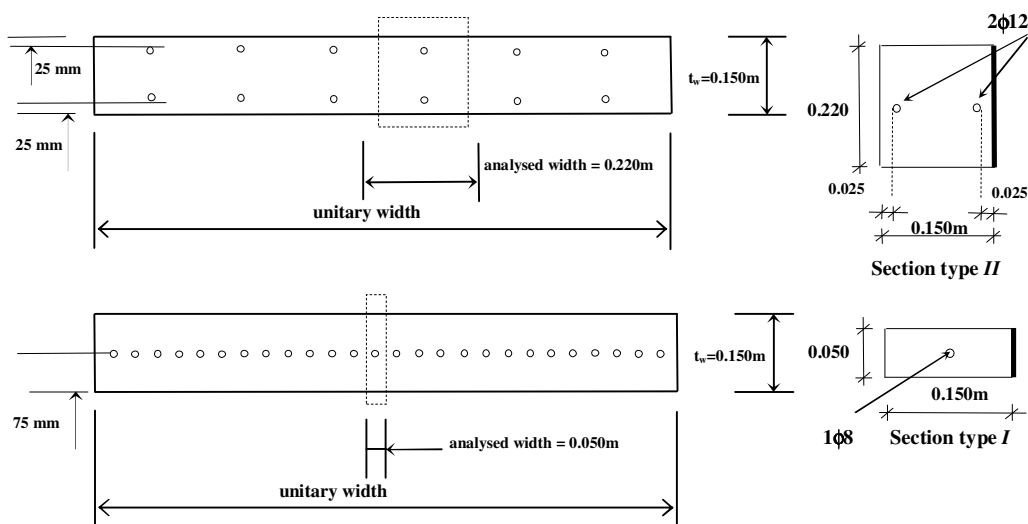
Cross-sections of the RC walls analyzed - sections type.
